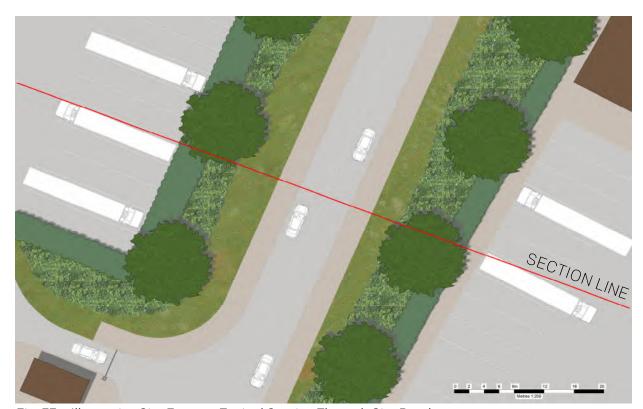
Illustrative Site Extract- Typical Section Through Site Road
